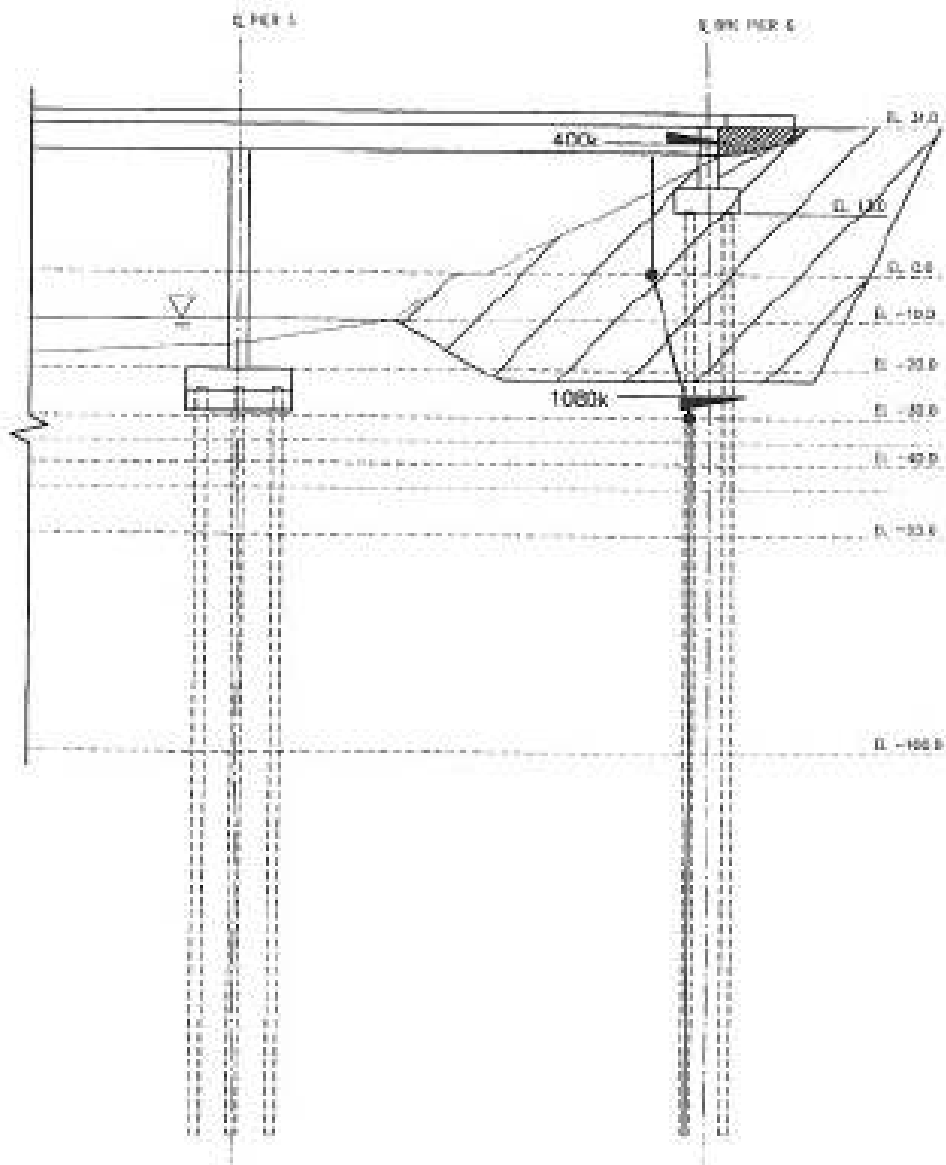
Plastic Hinge Location along the Pile, Washington Bridge, Pier 6
